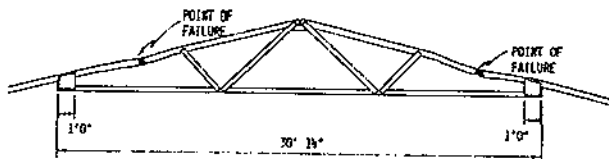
Roof truss showing points of failure under a uniformly distributed load of 40 pounds per square foot.
